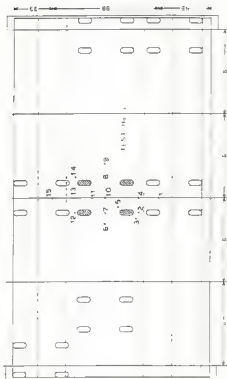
LVDT Locations (Fifth Bridge - Test No 1)
